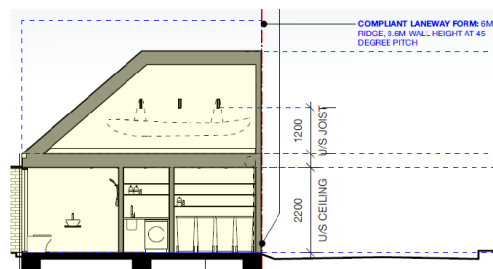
SECTION A- SHOWING REDUCED BULK AND SCALE OF THE PROPOSED OUTBUILDING WITH A GABLED FRONT AND HIPPED REAR ROOF FORM
